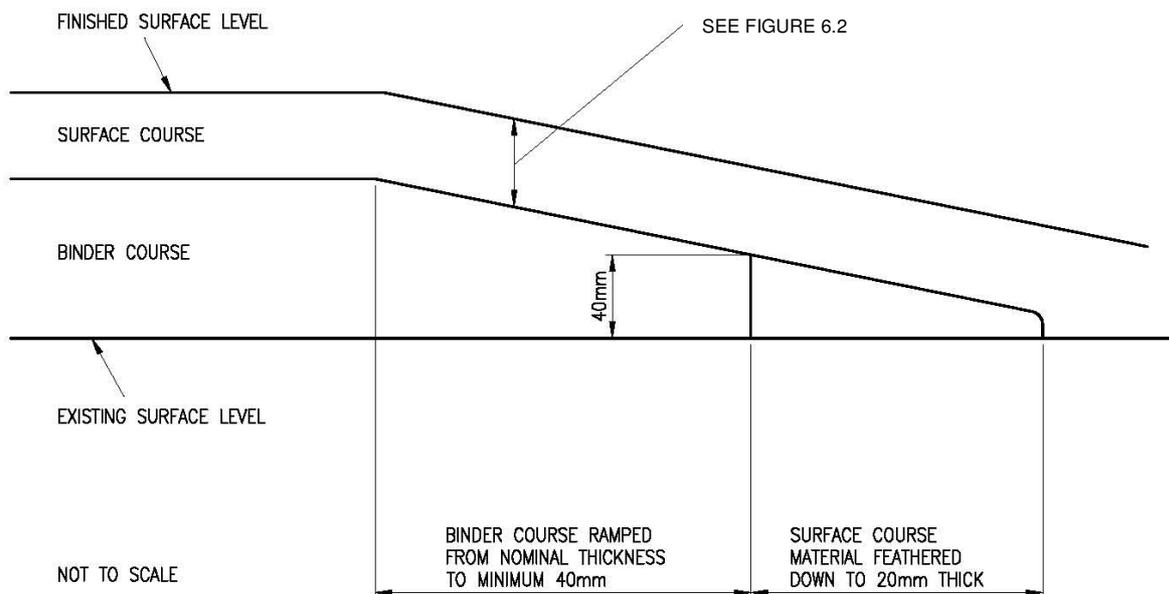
Ramps between New Surfacing and Existing Pavements
